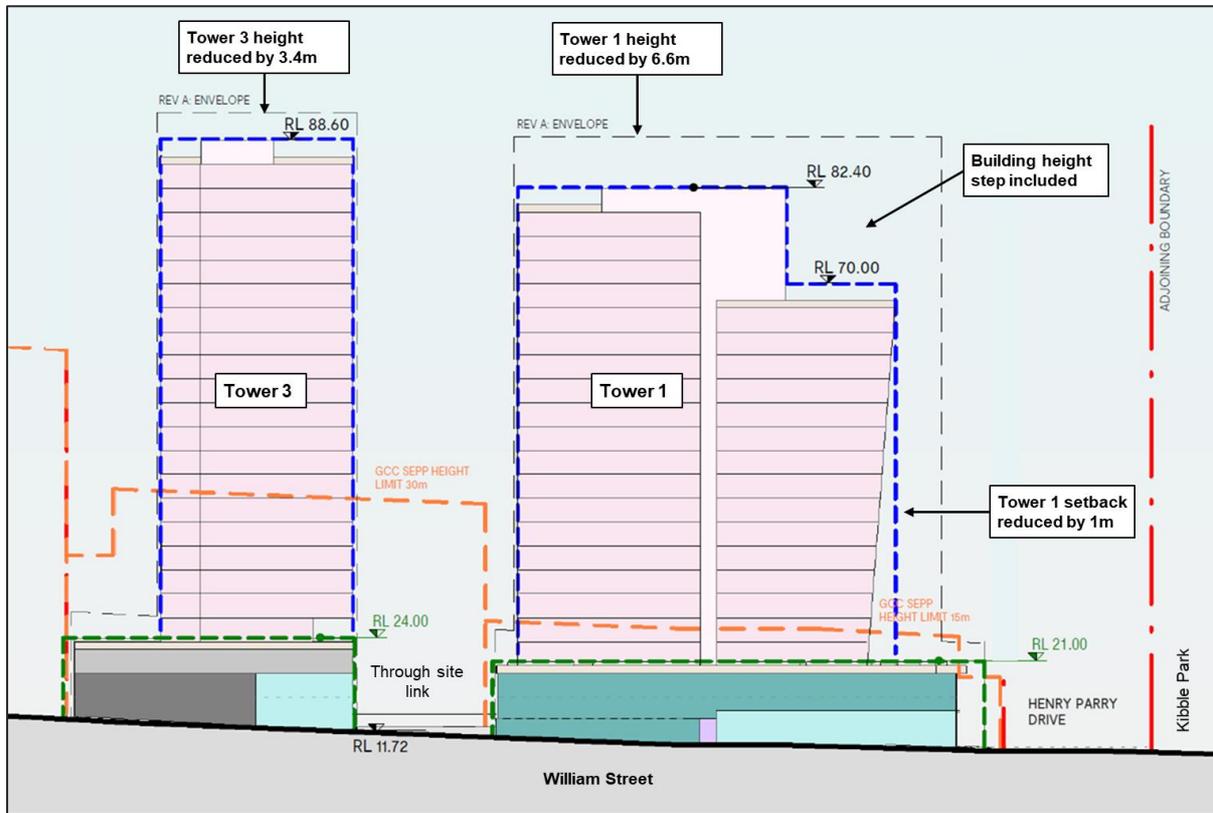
| Changes to Tower 1 and Tower 3 building envelopes (Base source: Applicant's RtS)
